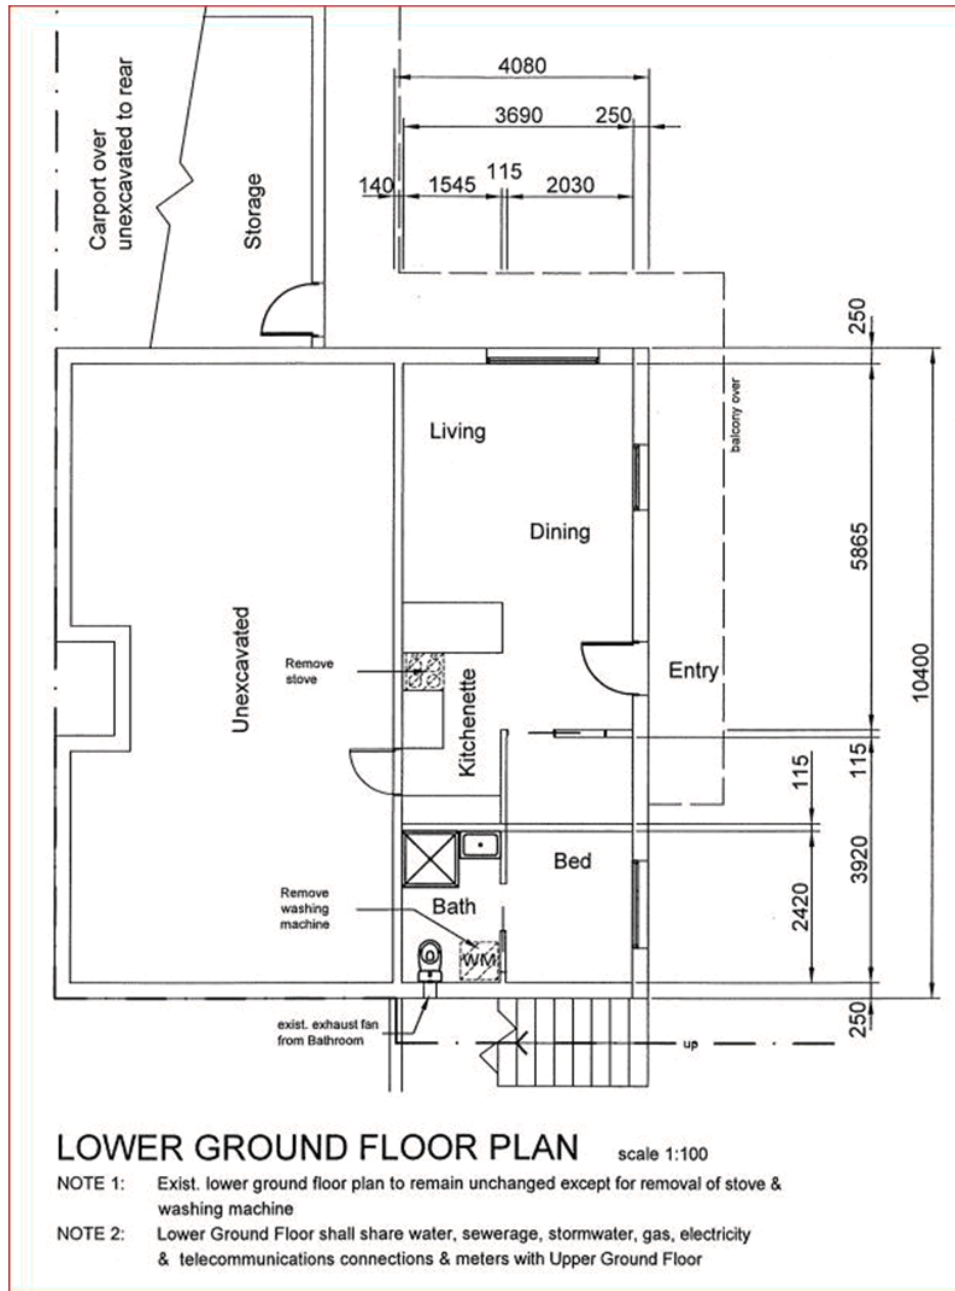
existing lower ground floor plan approved under PAE-19-329 on 9 October 2019.
